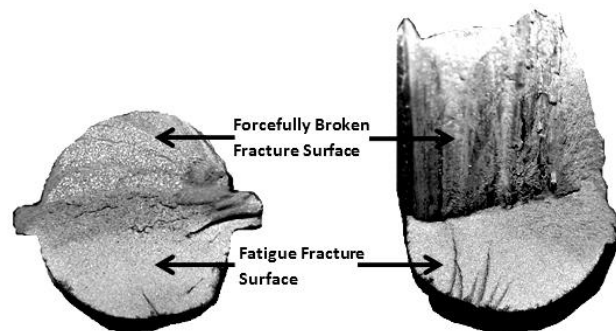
Low magnification fatigue fracture surfaces of 500 (left) and 300 (right) steel bars.
